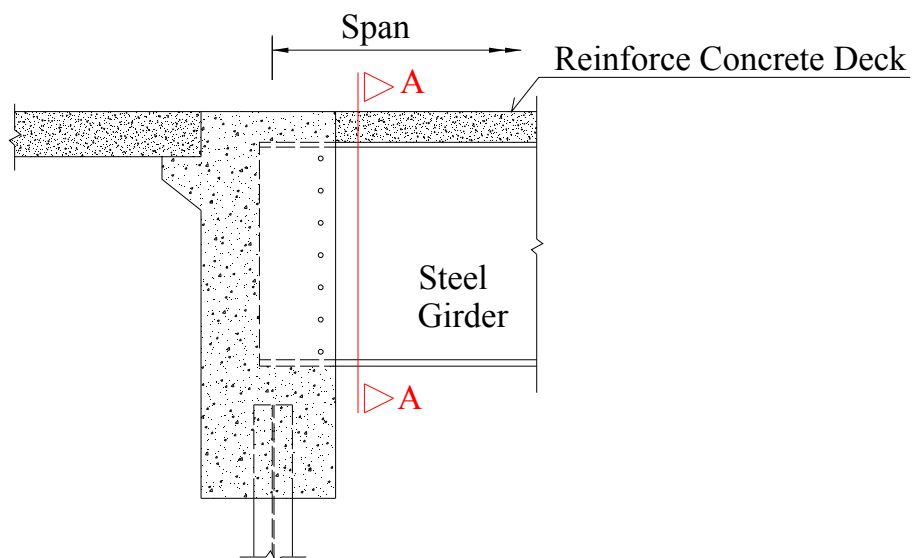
Superstructure Section at the Vicinity of Abutment Wall (Section A-A)
